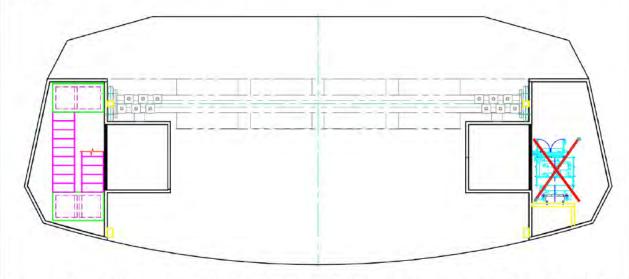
Tower cross-section showing the proposal to remove access elevator located inside the tower
